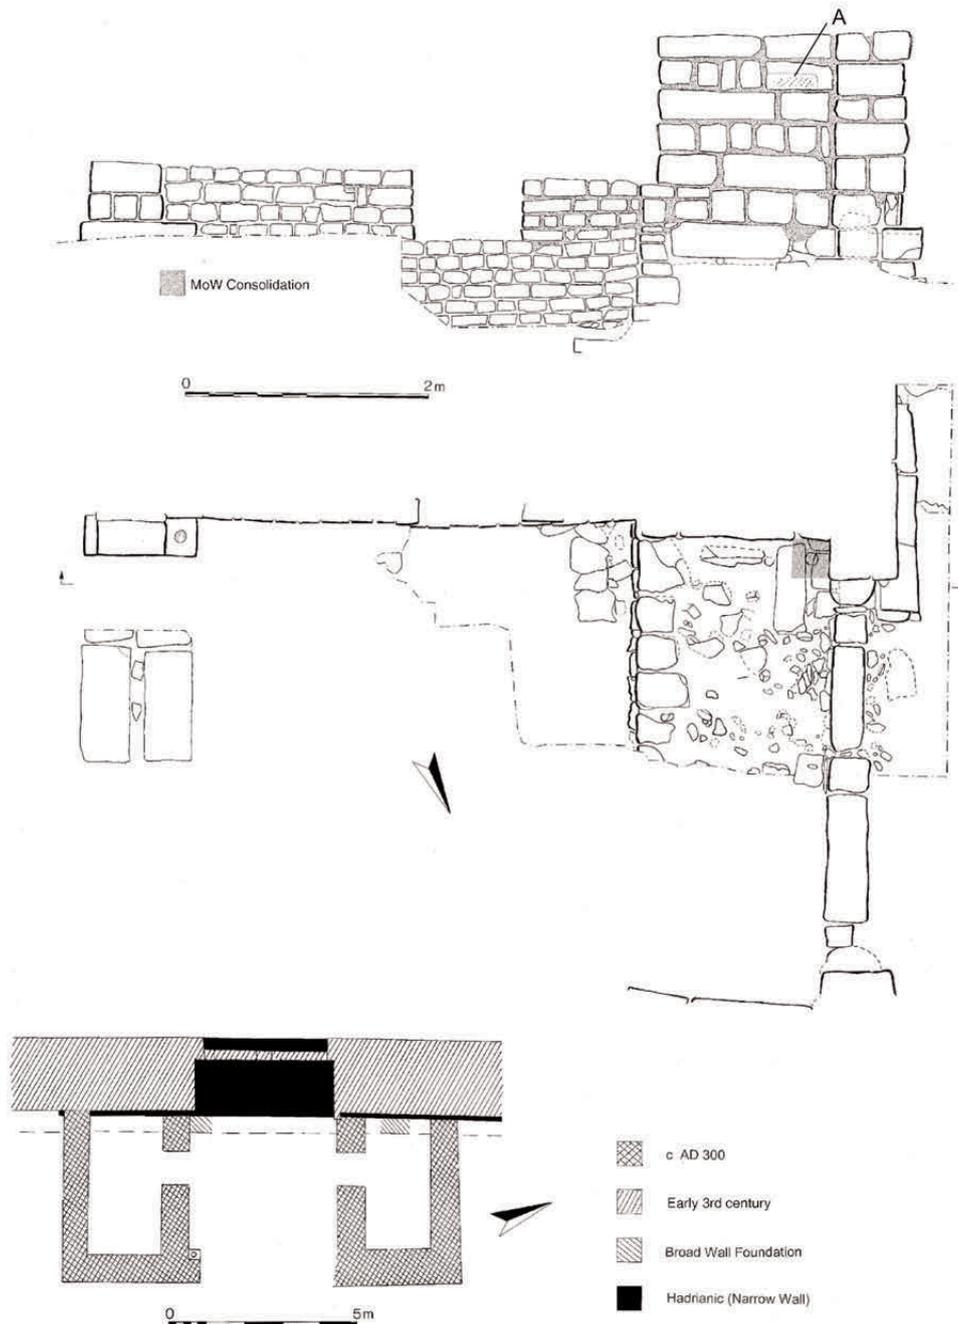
Knag Burn Gate excavation 1988: plan and elevation with interpretative phase plan (scale: main plan and elevation 1:50; phase plan 1:150).
